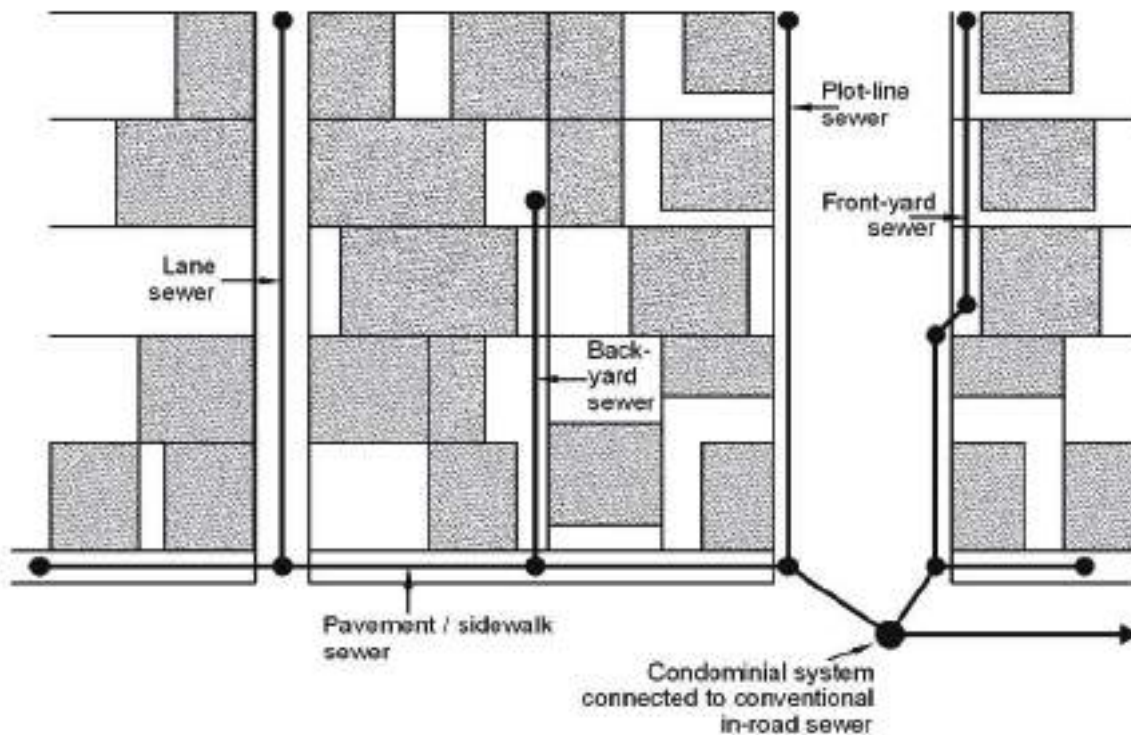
Simplified sewerage as avoiding public roads unless actually required
